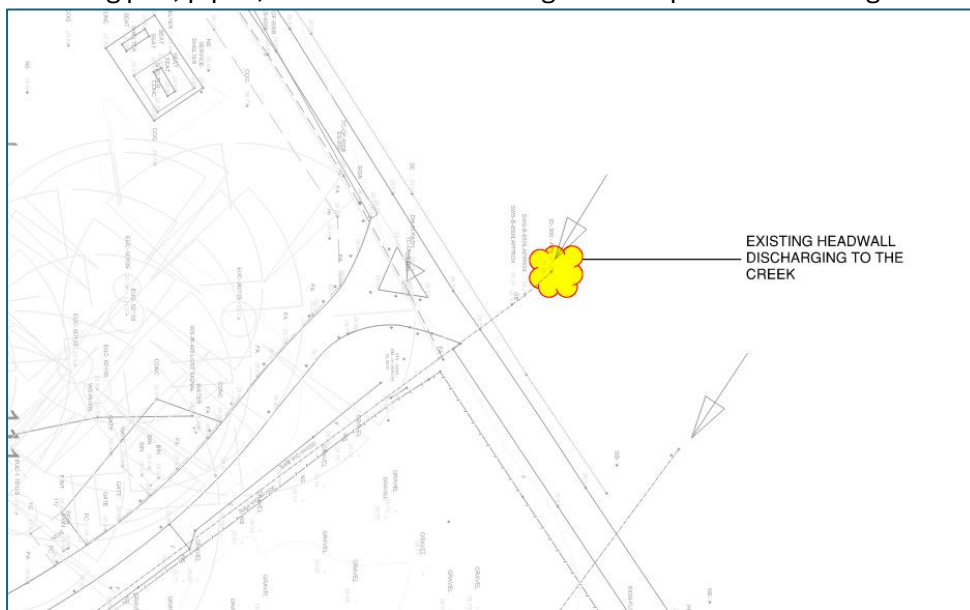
Existing headwall at Orphan School Creek (Source: Survey Drawing)
